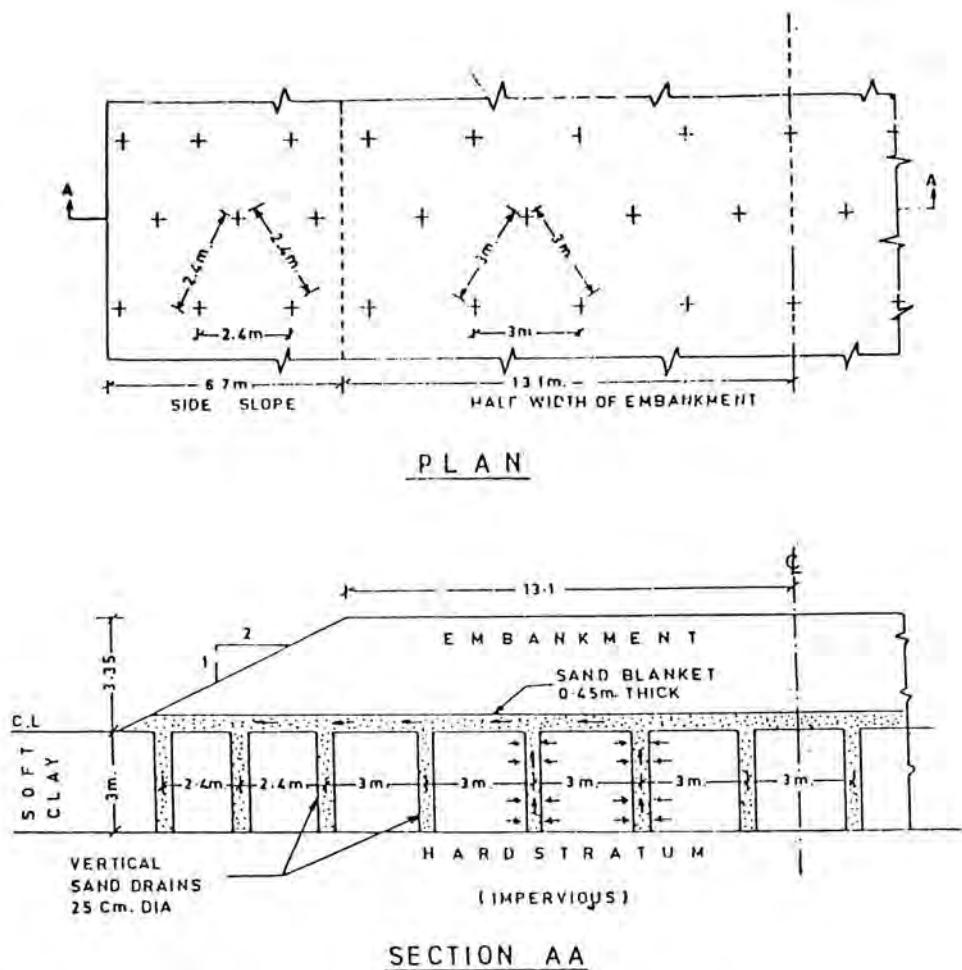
Embankment Construction with Sand Drains (Mehra & Natarajan, 1962)
